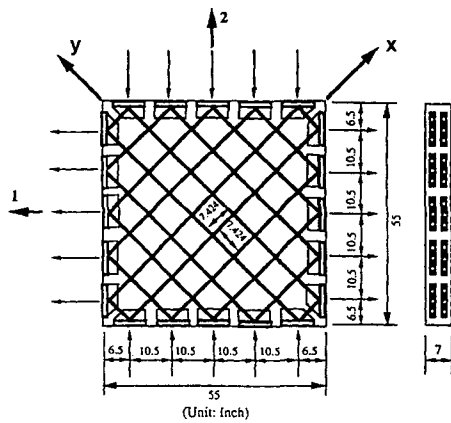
The reinforcement arrangement and loading directions tested by Hsu and Pang
